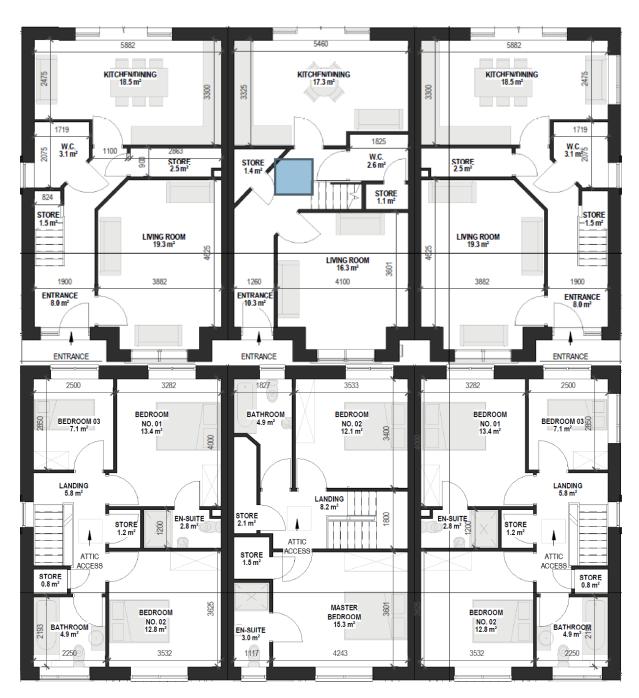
Typical ground floor plan of House Type 5.1 (top) and typical first floor plan of House Types 5.1 (bottom). The area within the red dashed line represents the ground and first floor plans for House Types 5.2 & 5.5.
